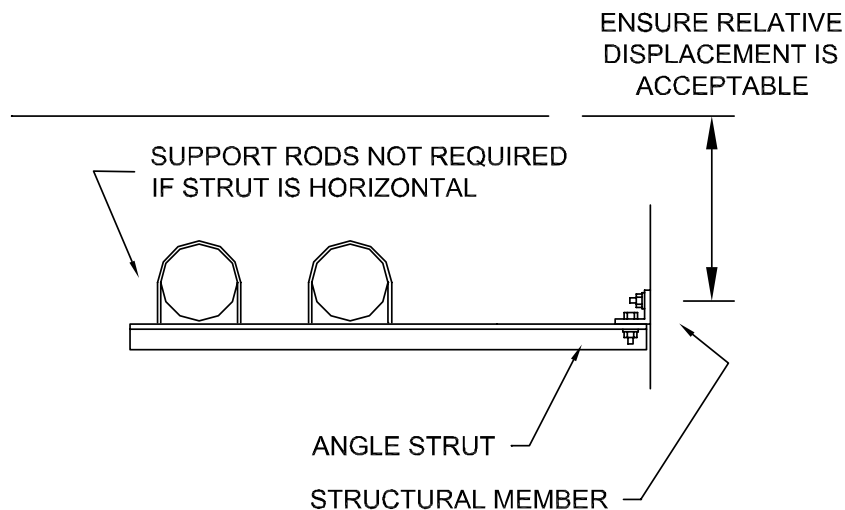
; Trapeze-Supported Piping Restrained to Structural Wall or Column with an Sloping Strut
